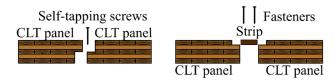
Half-lapped joint (left) and single spline (right) connections of CLT floors.
